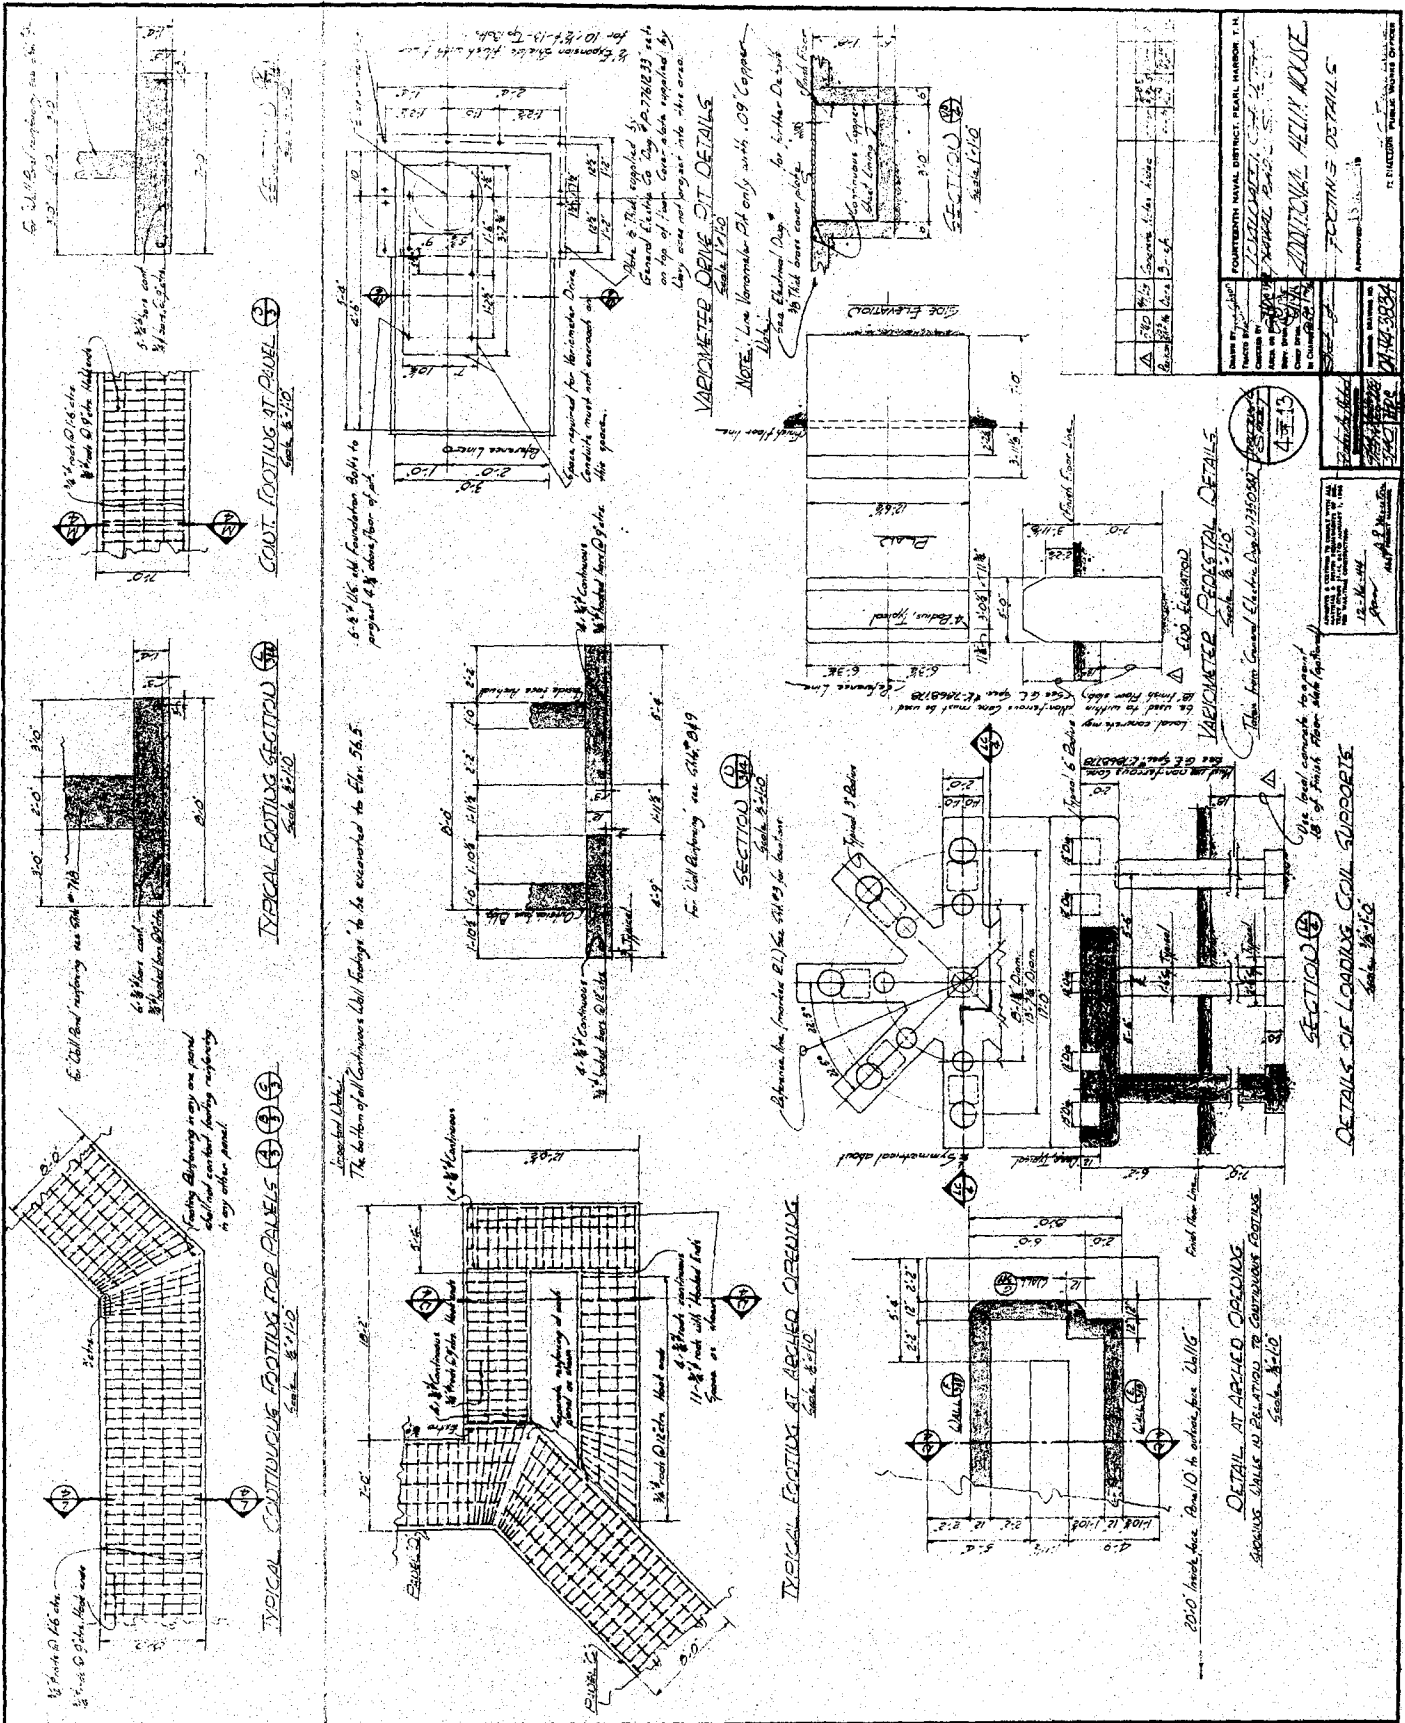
Drawing No. OA-N04-3834: Footing Details (reduced).
